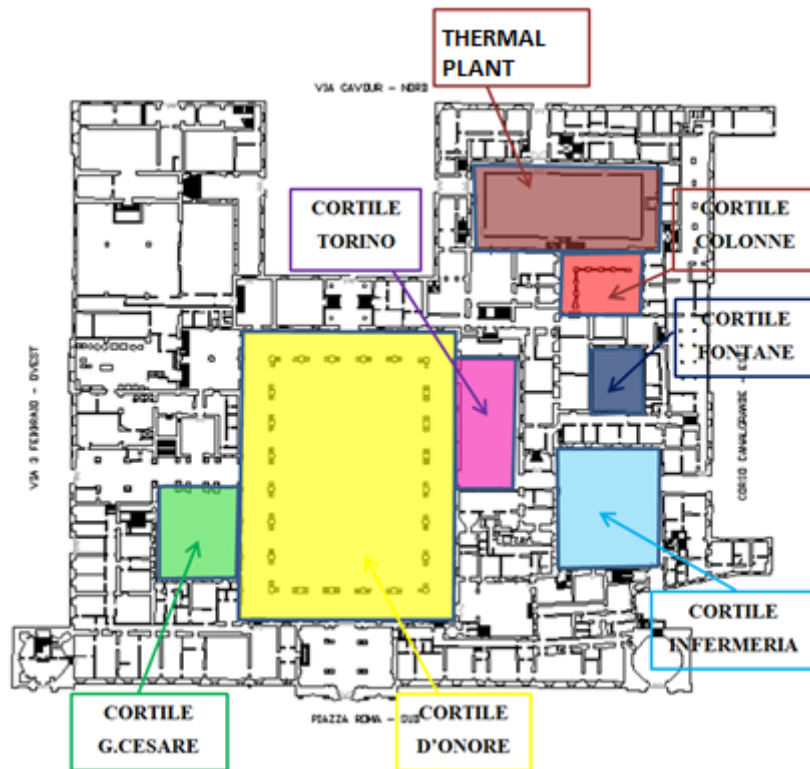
Ducal Palace Planimetry - Internal Courtyards
